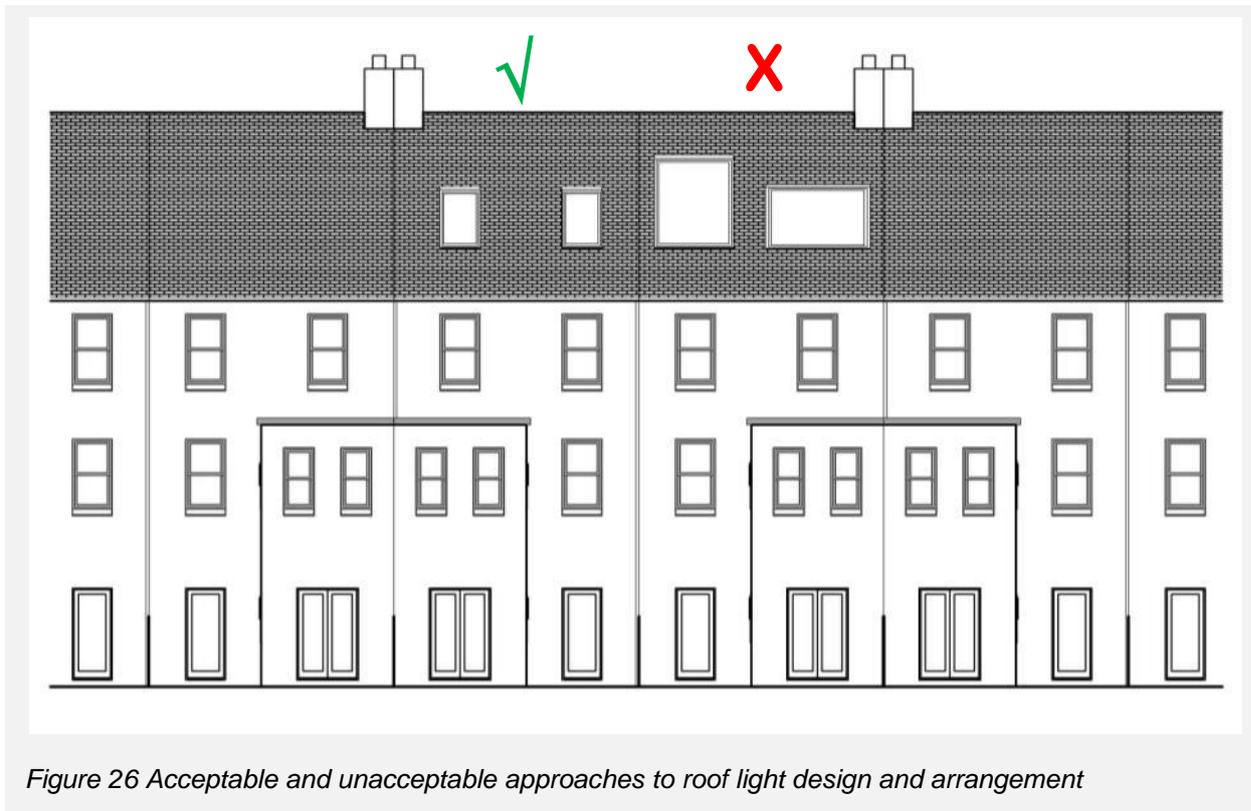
Acceptable and unacceptable approaches to roof light design and arrangement
